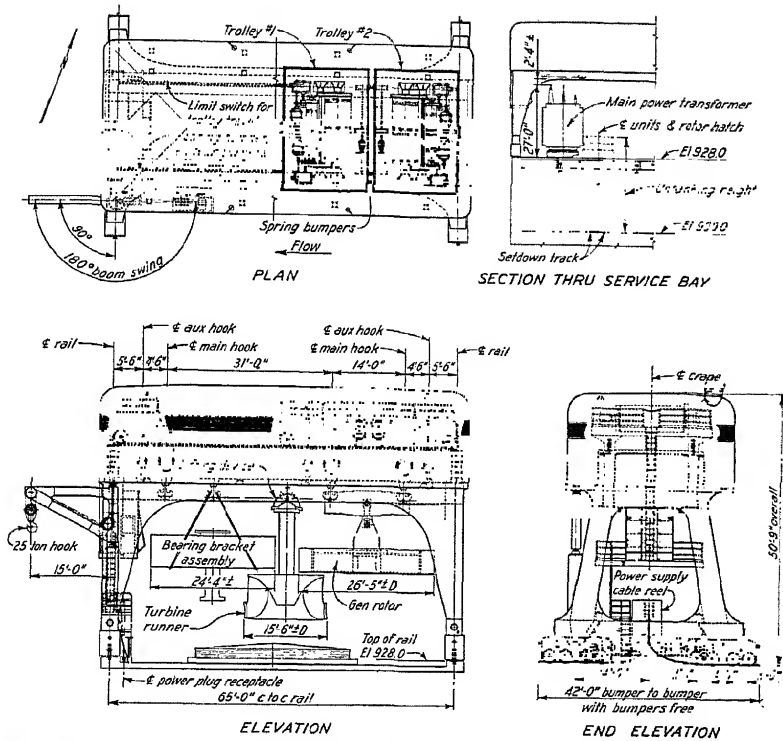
Powerhouse 225-ton-capacity gantry crane—Plan, elevations, and section.
